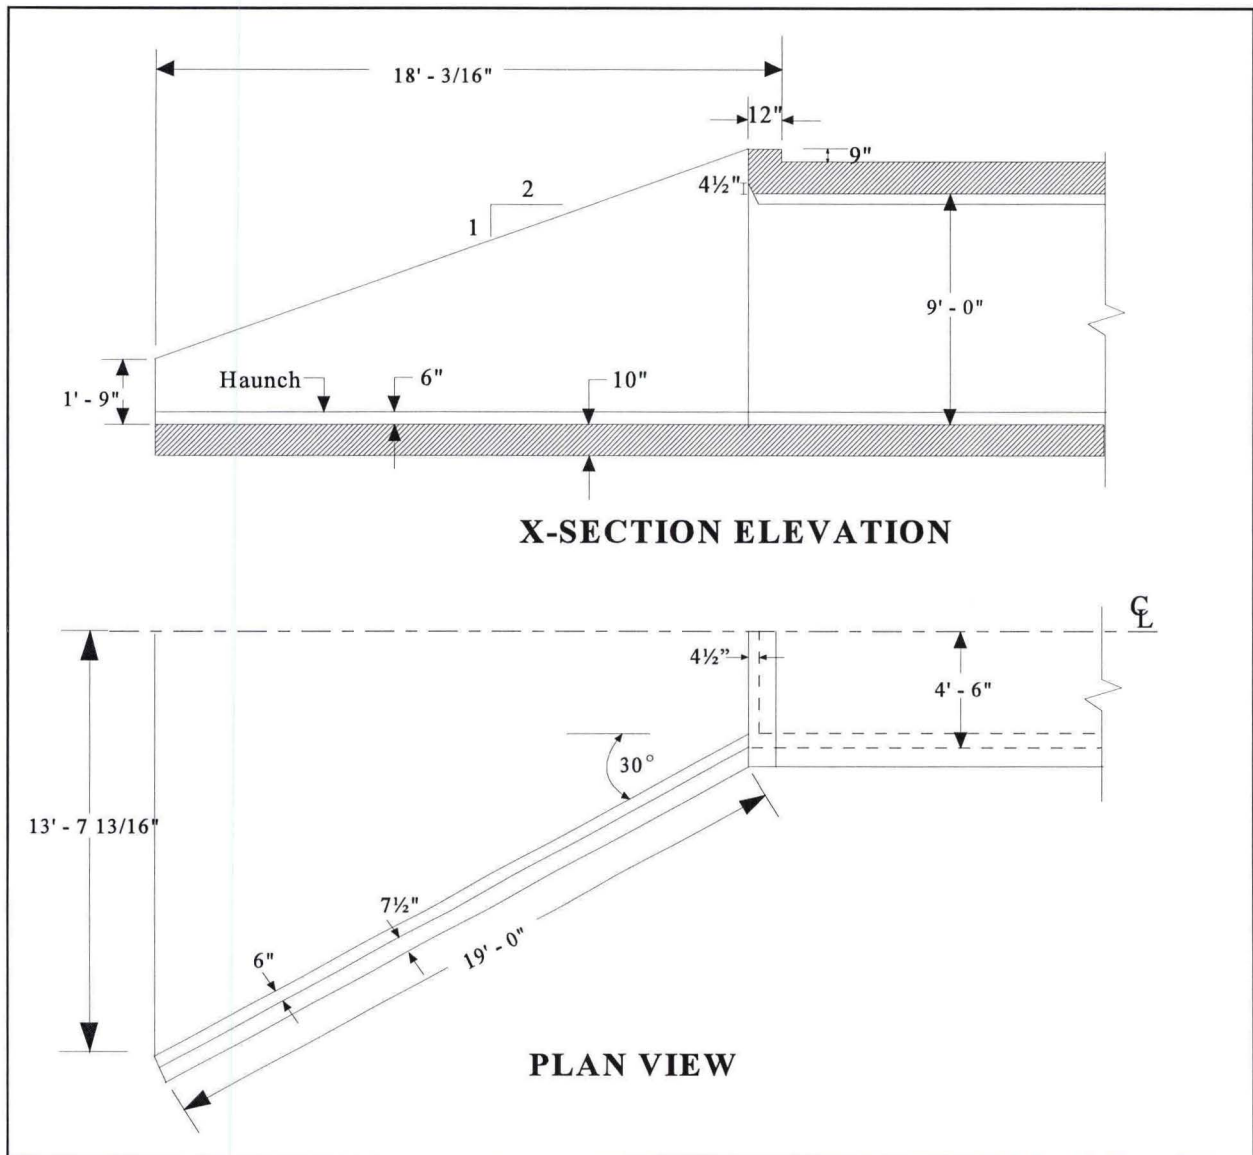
Sketch of South Dakota cast-in-place culvert inlet, 30° wingwall flare (tested by culvert model 3).
